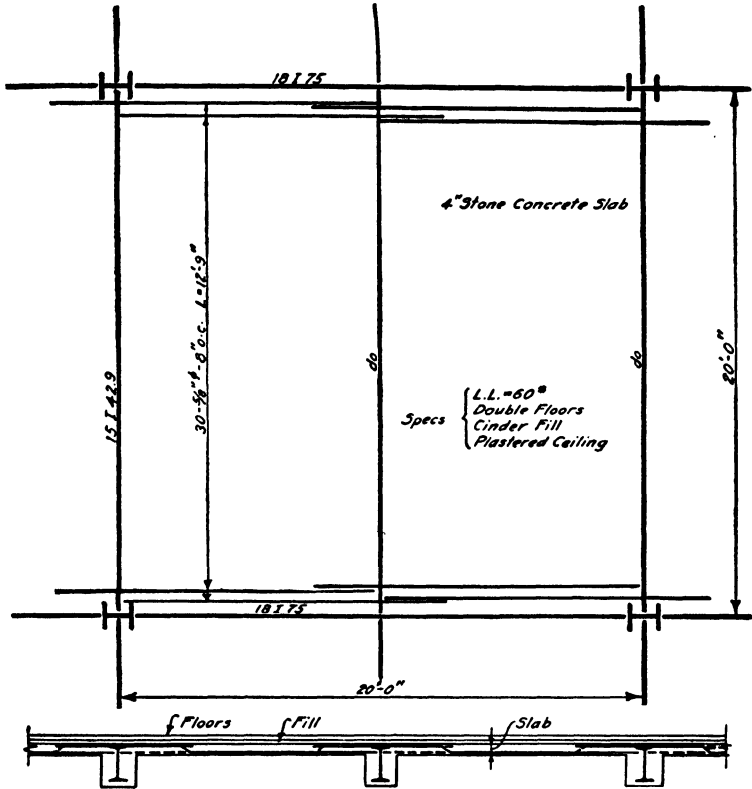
Framing for One-Way Stone Concrete Slab in Steel Frame.
